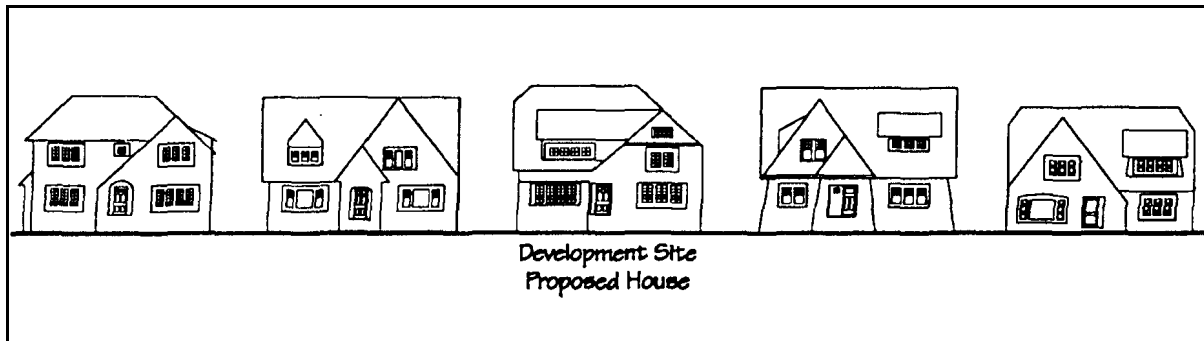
Streetscape Example (1) Showing Window and Door Patterns and Elements
